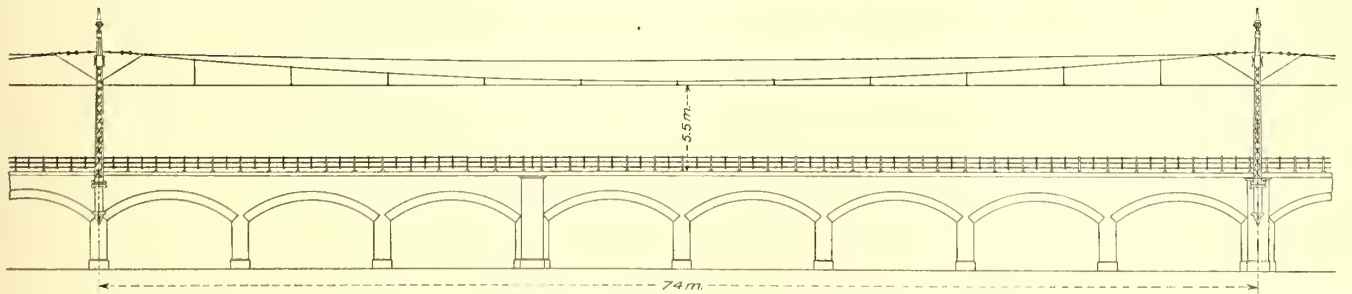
European Catenary Construction—Side Elevation of 228-ft. Span
